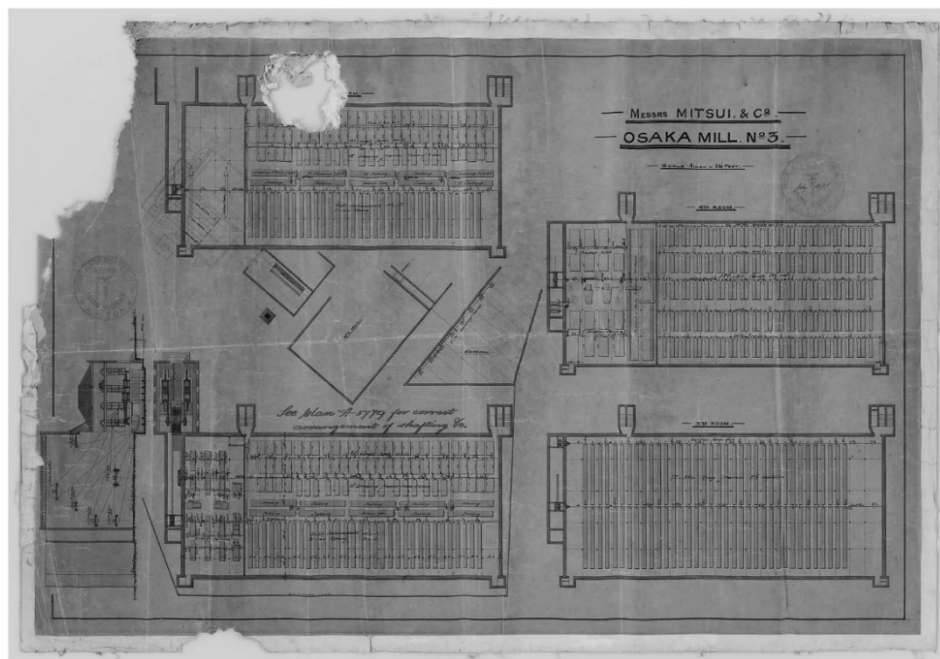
Machinery layout plans, Mill No. 3 at Osaka Bōseki [2-11]
